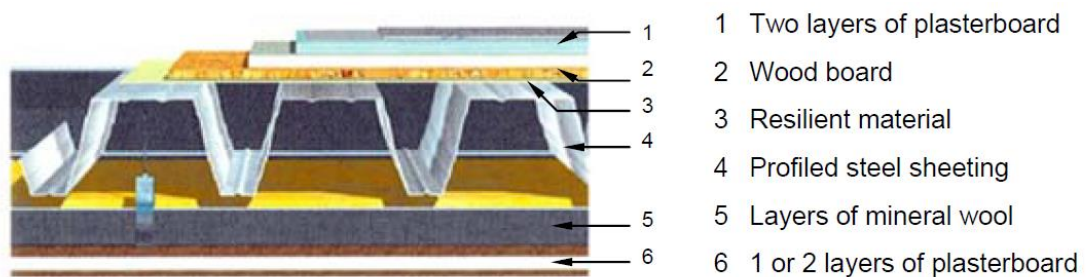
Lightweight dry floor (Arcelor Mittal & Peiner Träger 2008 a)
